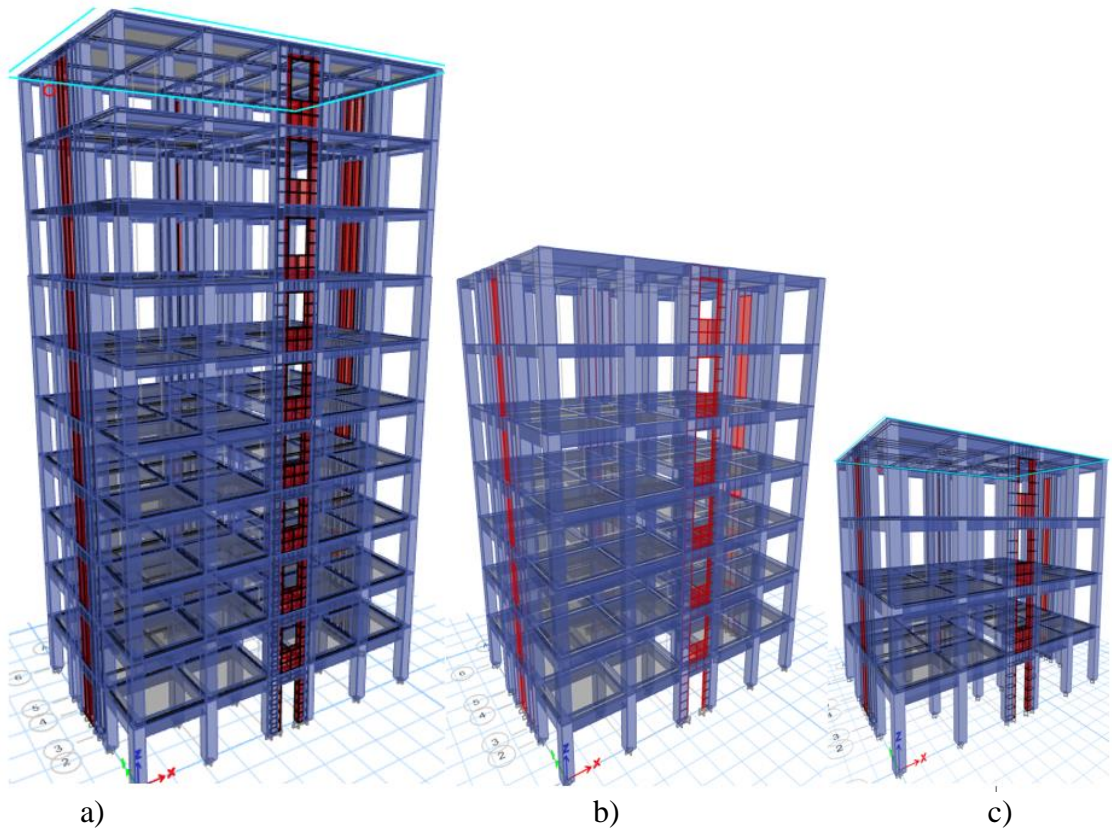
Structural Frames of The Designed Multi-Story Buildings.
